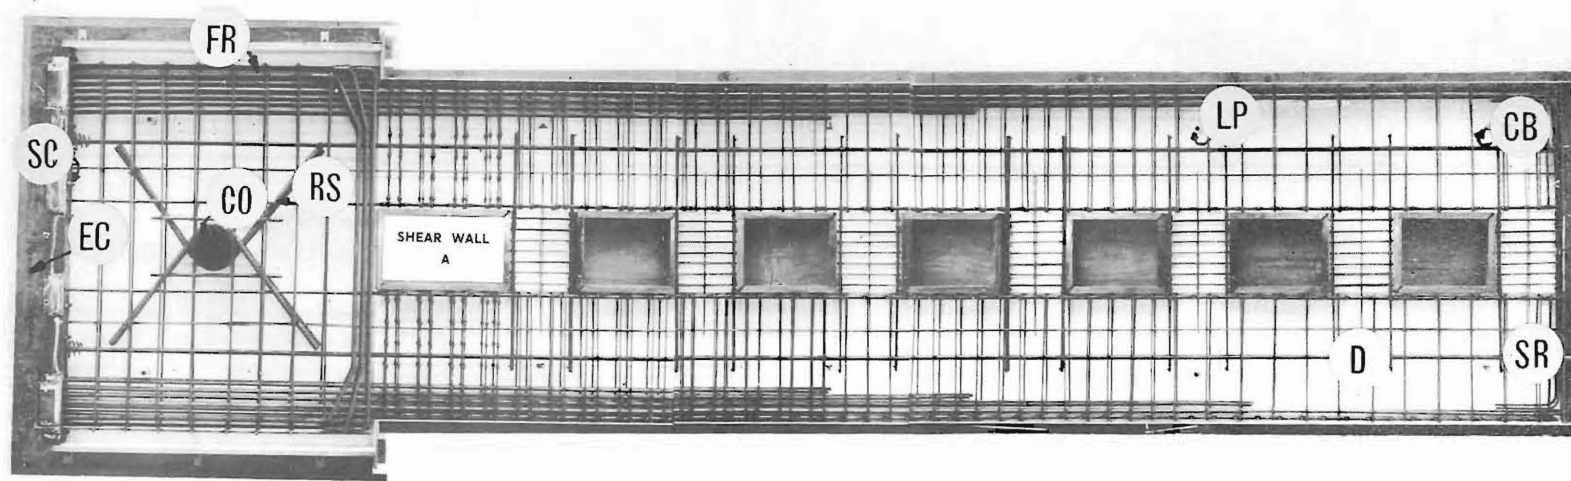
DISPOSITION OF REINFORCEMENT IN SHEAR WALL A
